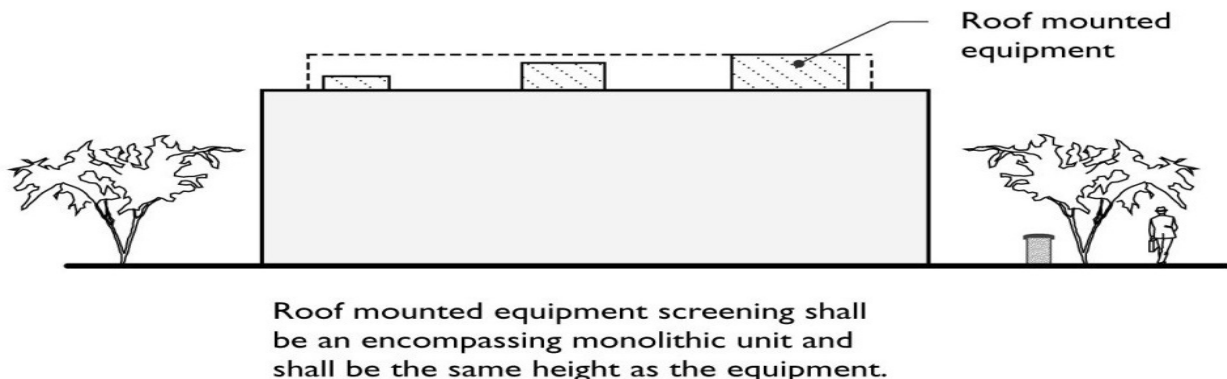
A.1. Screening of Roof-Mounted Equipment
